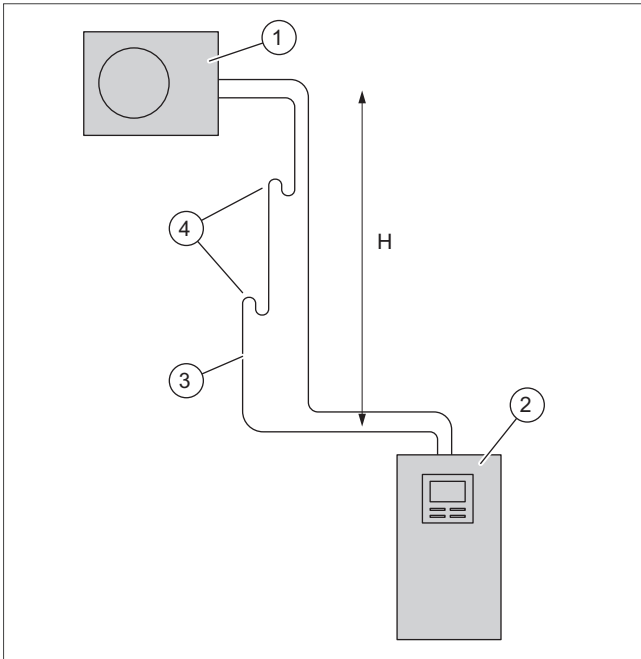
Outdoor unit above the indoor unit, height difference, oil elevation elbows
